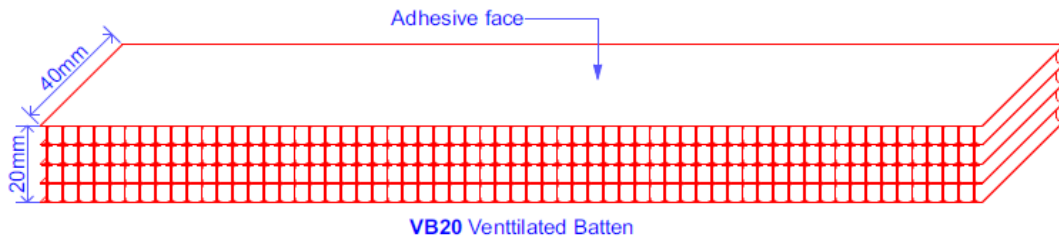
D Render of VENT VB20 Wall Cavity Battens in use with VENT Passive Ventilation
